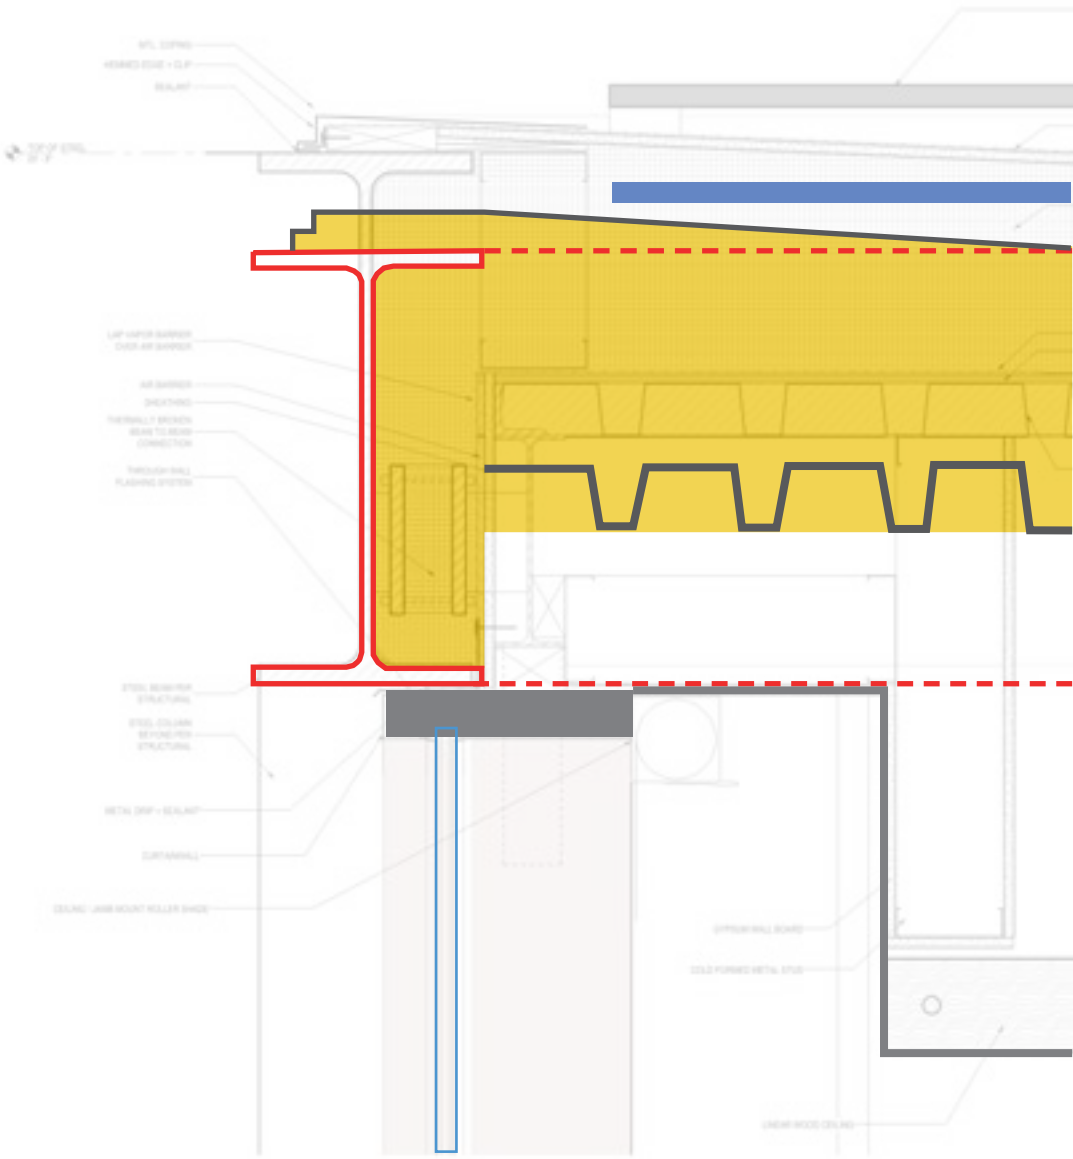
DETAILING AND CONNECTIONS AT SOLAR CANOPY & HISTORIC BUILDING
